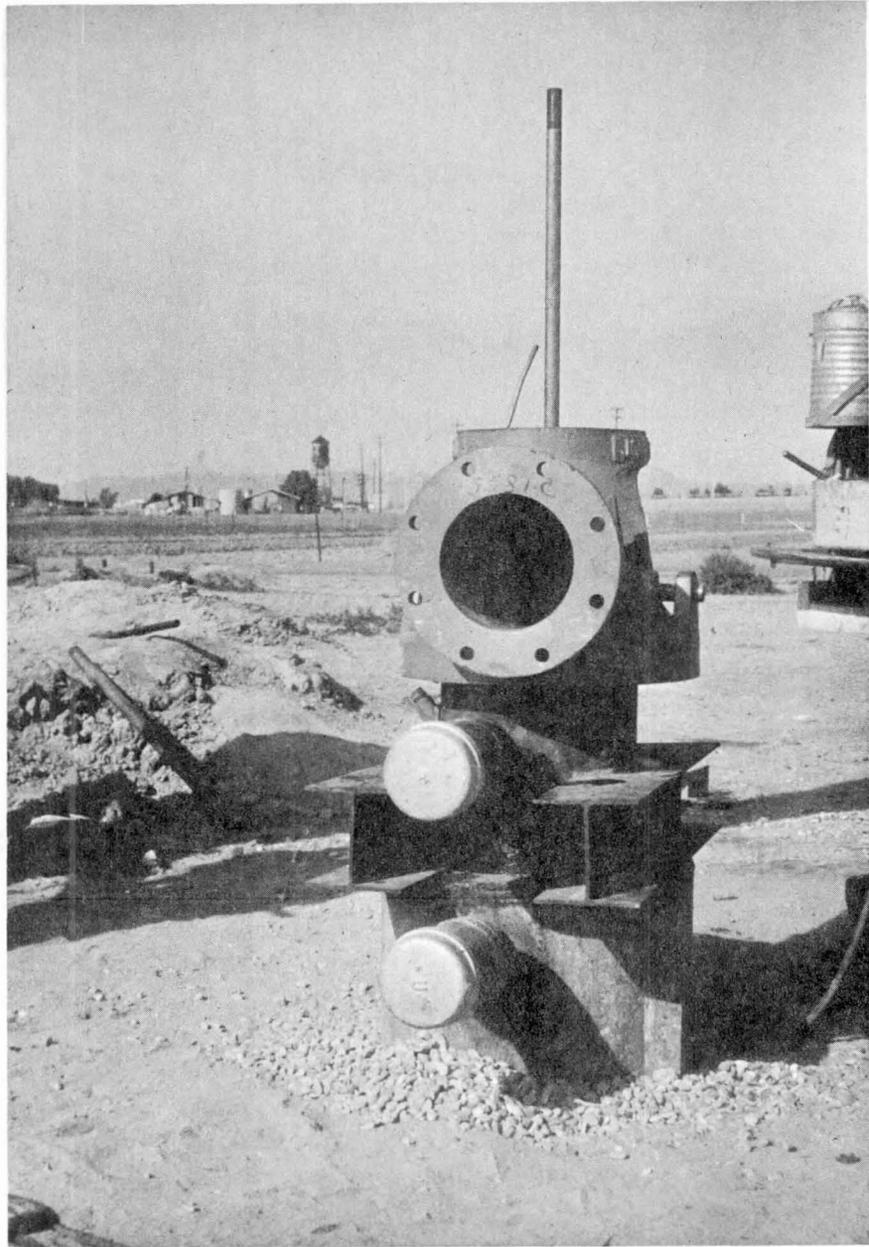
WRRS RECHARGE WELL SHOWING INLETS AND PUMP HEAD
